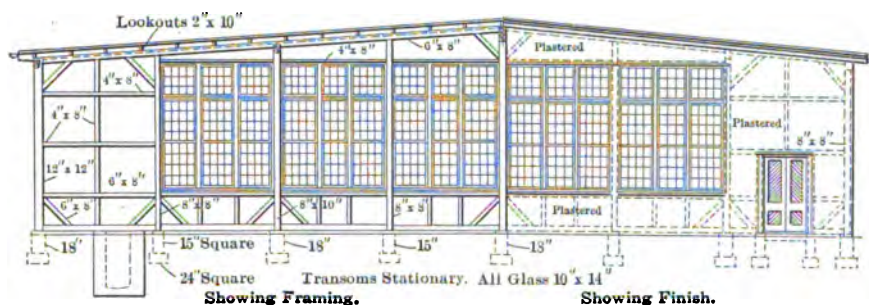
Elevation of end walls, Decatur, Ill., engine-house—Wabash.
